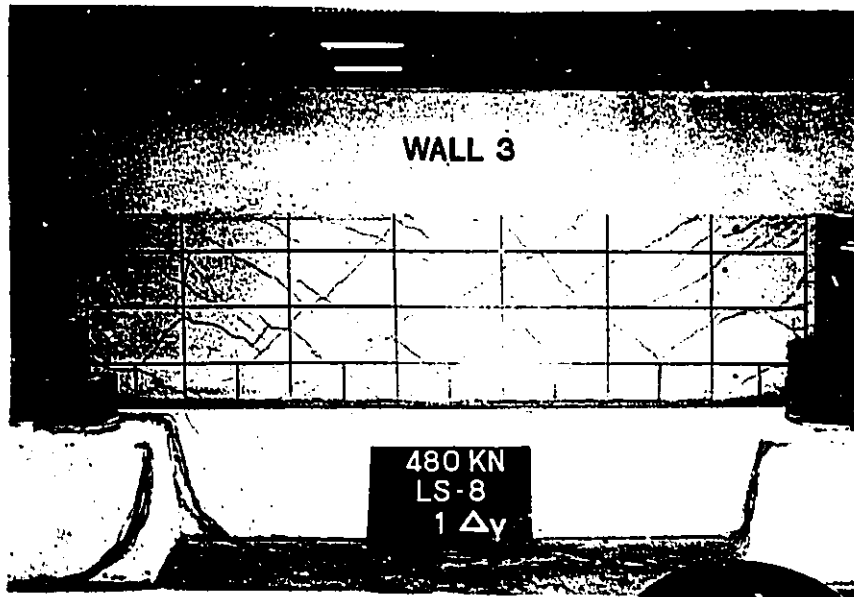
Wall 3 crack pattern at $1\Delta_y$
